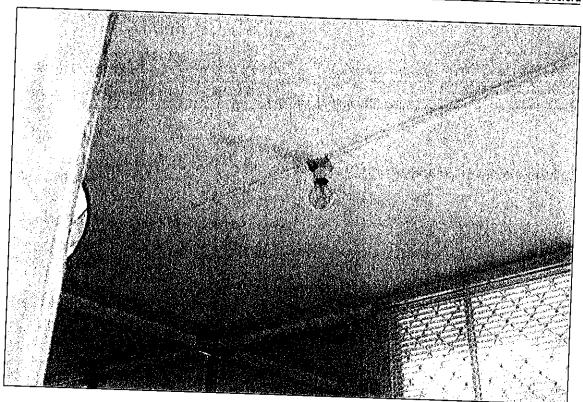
Fibrous Cement Wall Lining to Verandah (Asbestos Free)
